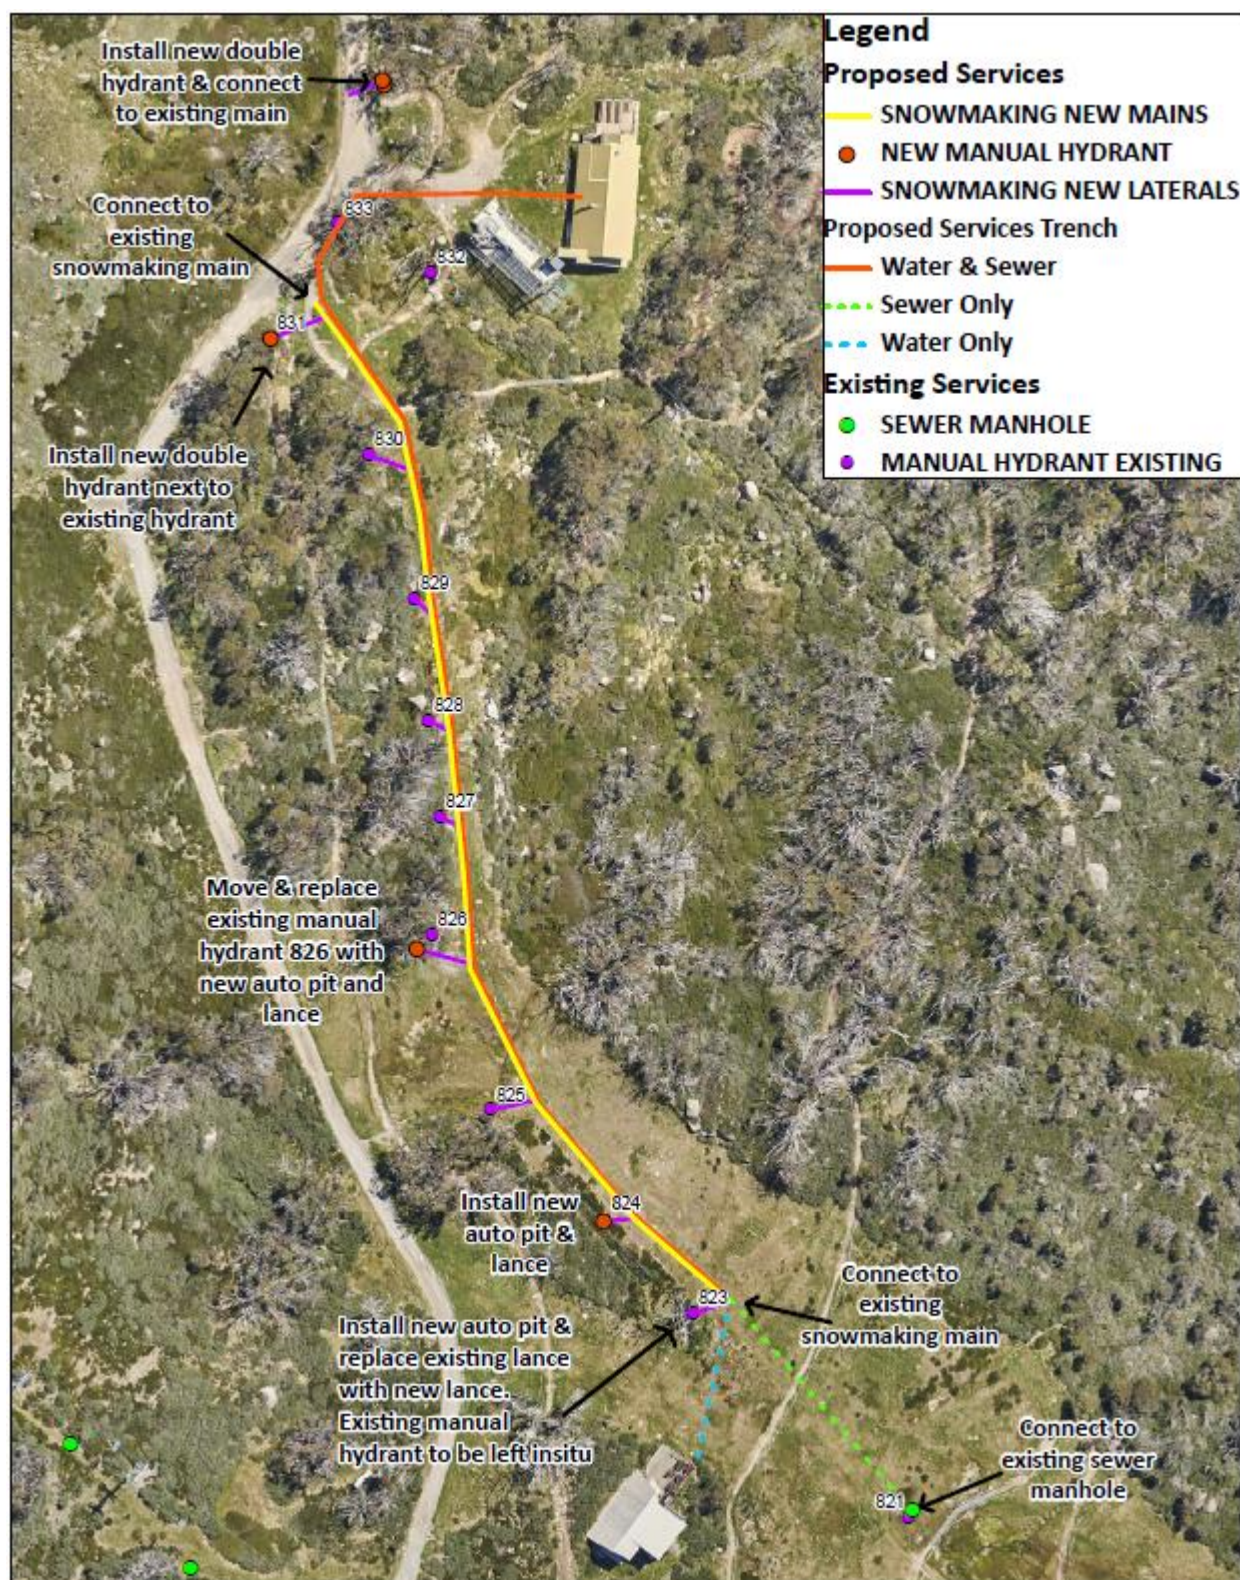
| Village trail area showing proposed snowmaking and services infrastructure (Source: Applicant's Documentation)
